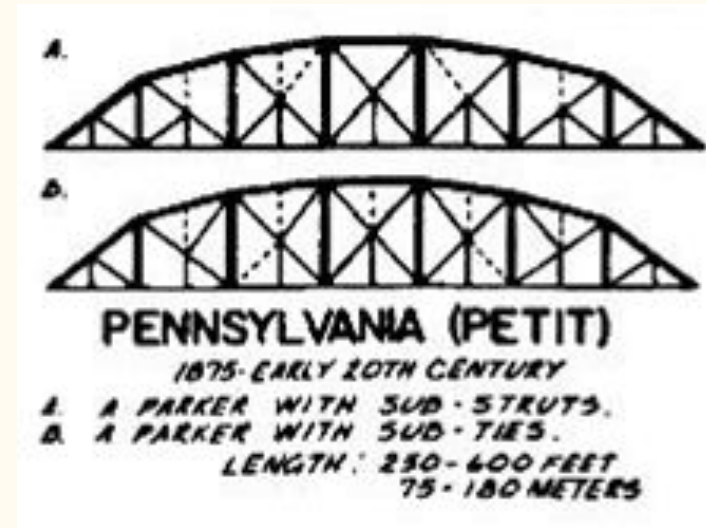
Shows the Pennsylvania Truss Design (Source: HAER)
